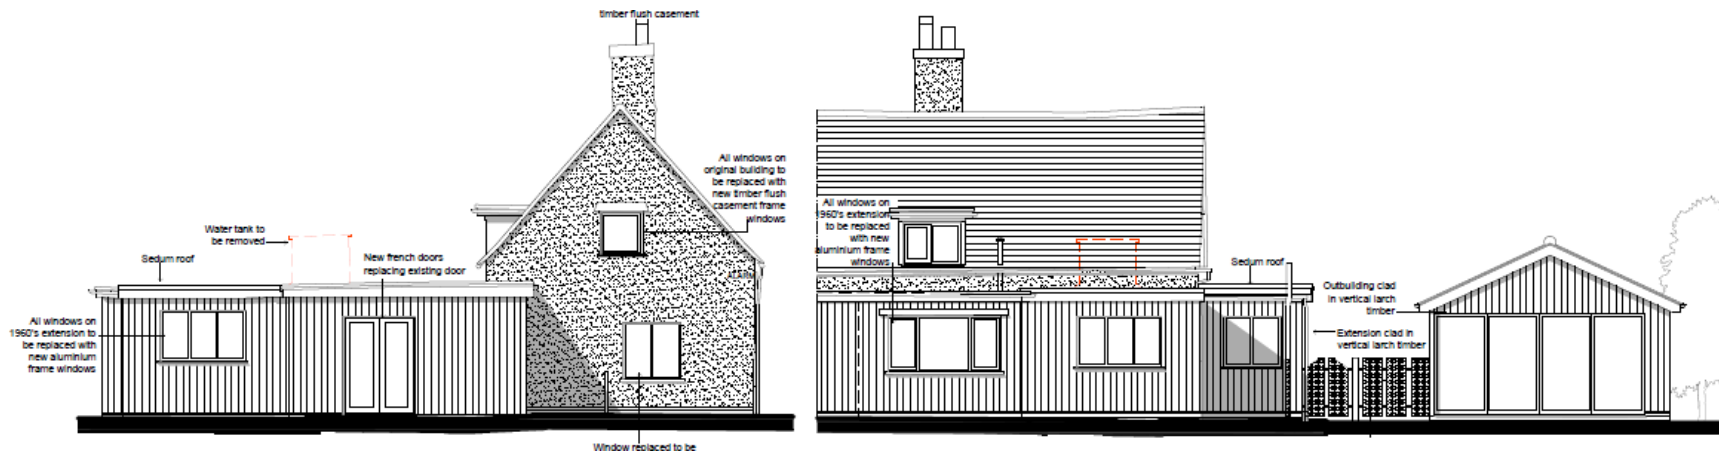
Proposed elevation south without outbuilding AND proposed elevation west
